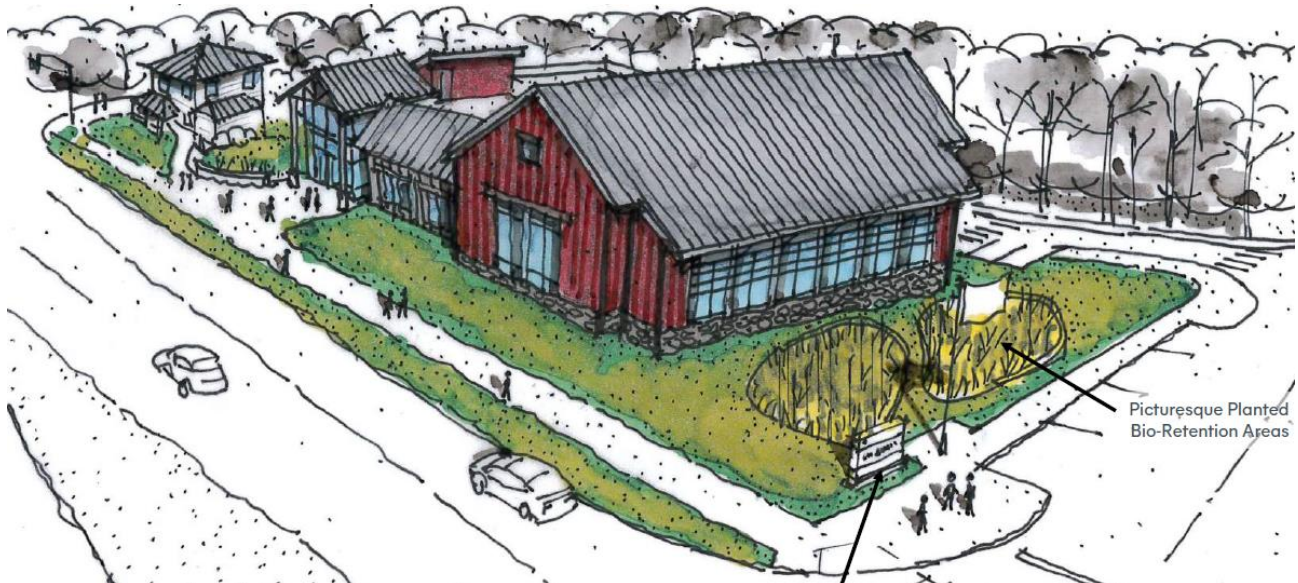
Site perspective looking northwest from the intersection of Stringtown Rd. and Clarksridge Rd.
